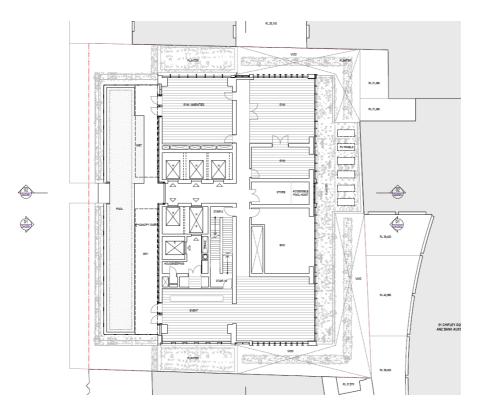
| Proposed level 12 (Source: Woods Bagot)
